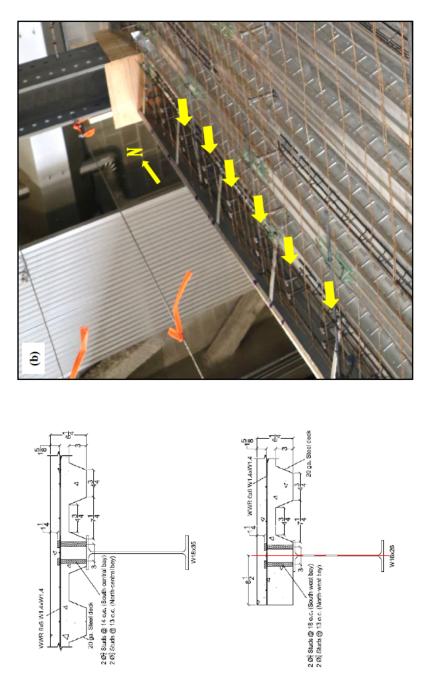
(a) Images showing the composite girder-concrete sections with pairs of headed shear studs and (b) construction photo of the northwest corner of the test frame showing the pair of headed shear studs welded to the W16x26 girder.
